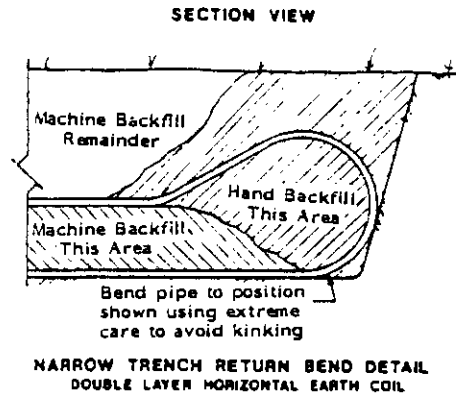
Horizontal Earth Coupled Pipe Separation in the Trench
